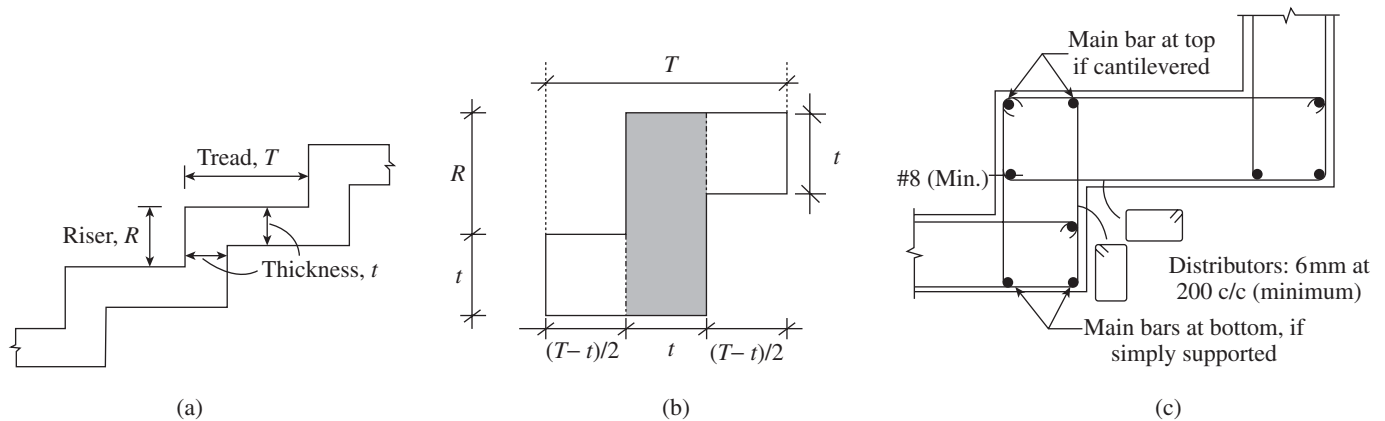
Transversely spanning tread-riser stair (a) Typical tread-riser arrangement (b) Tread-riser unit taken for design as Z-section (c) Detailing of tread-riser stair
